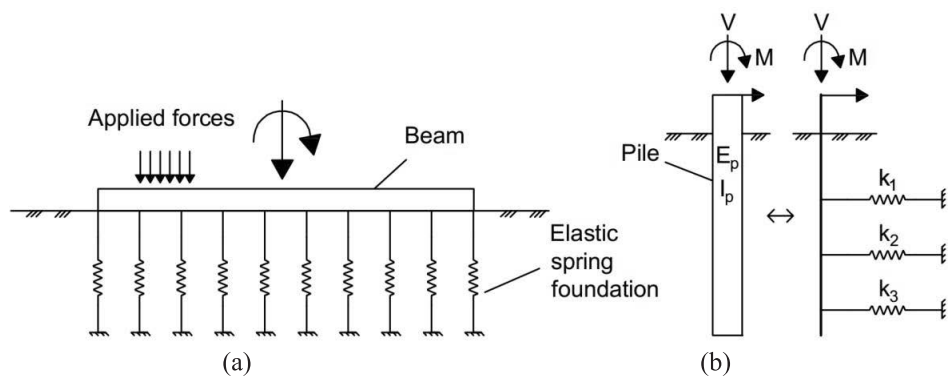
(a) Beam on elastic foundation, (b) Pile idealized as a beam on Winkler foundation
